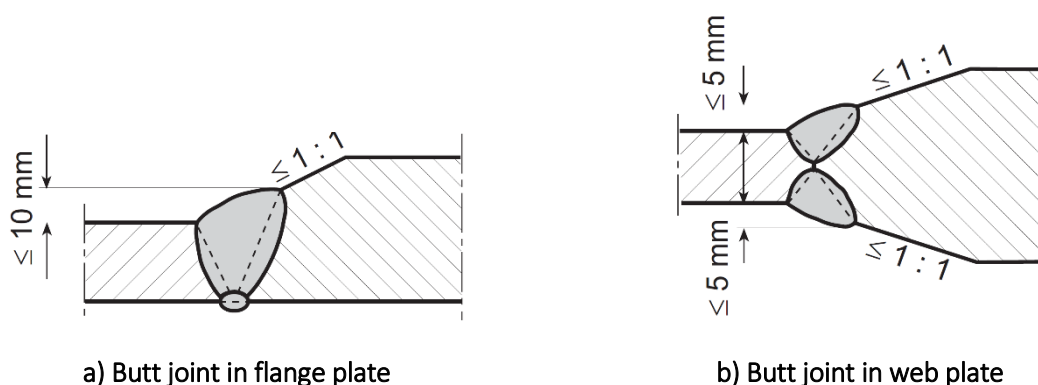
Butt-welded joints in plates of different thickness
